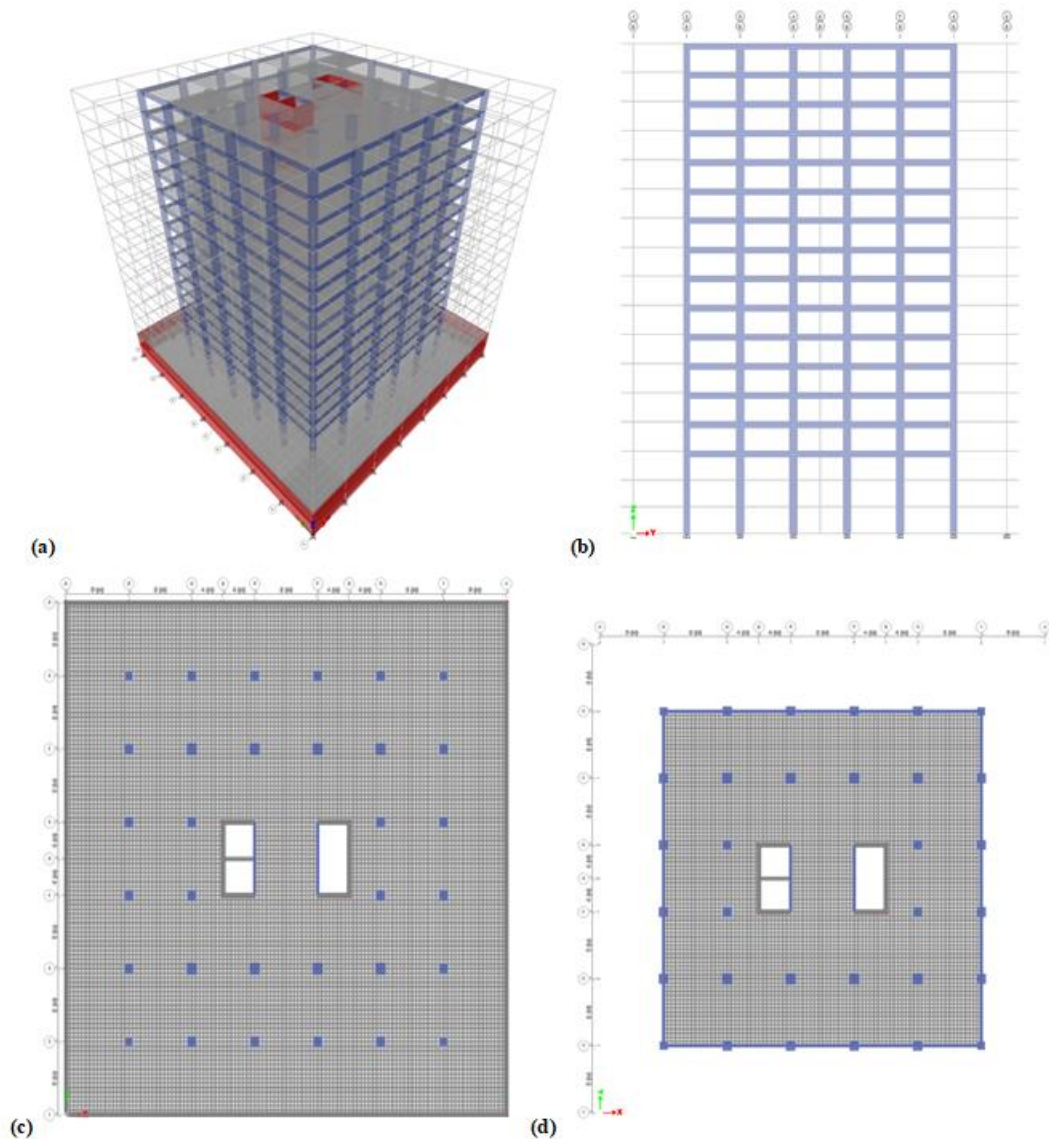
Schematic representation of (a) building 3D view (b) building elevation (c) floors plan of the 2 basement (d) and typical floors plan of the 15-storey framed building.
